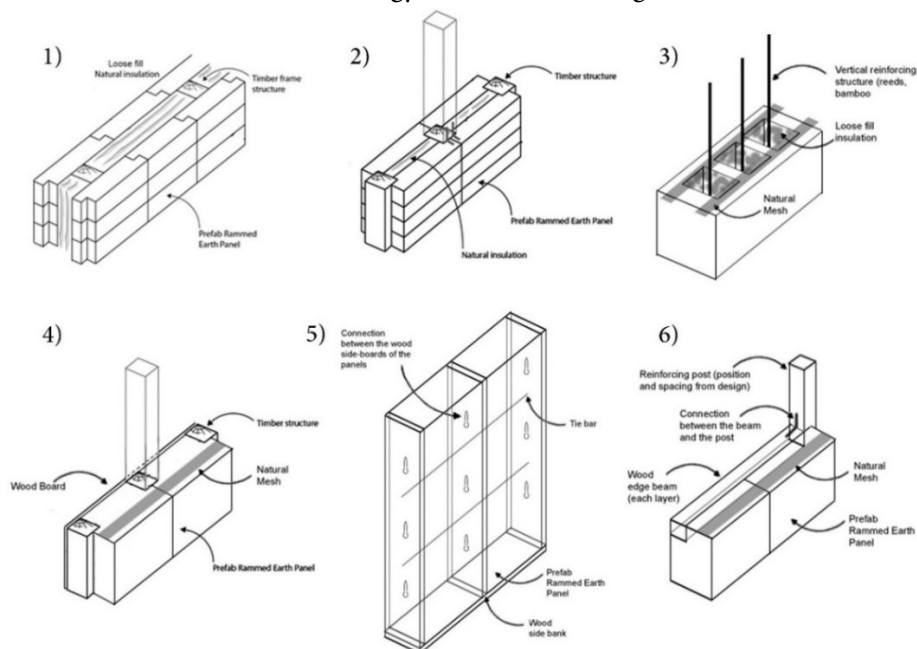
First sketches on the mixed rammed earth - timber technology.
